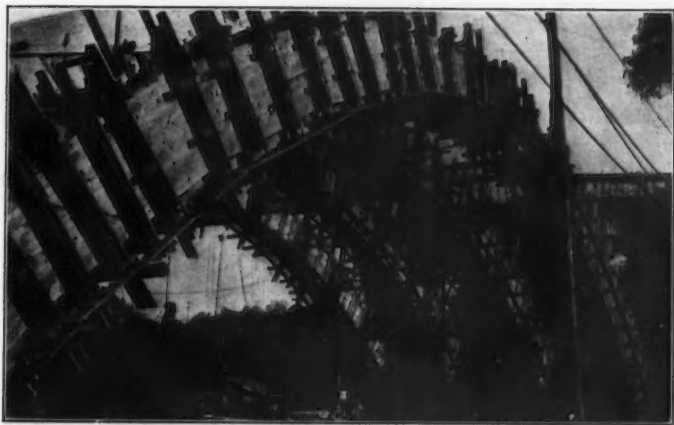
MAIN STREET VIADUCT, SPAN C: SHOWING RIBS COMPLETELY FORMED.
